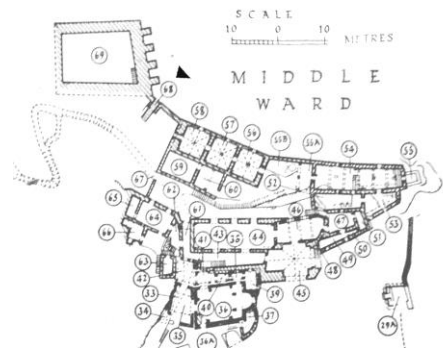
Department of Antiquities Plan, detail showing the postern n. 68 (Megaw, 1963).
